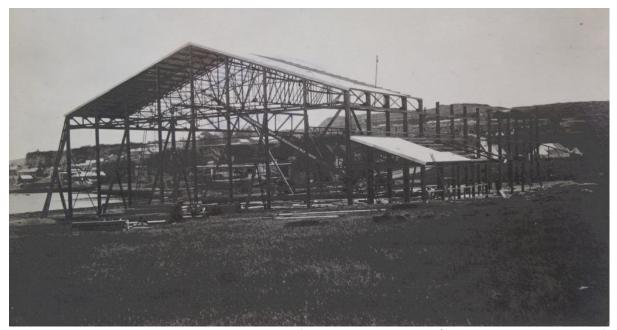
The large F-type hangars under construction, 1917 (The National Archives: Air 58/9, Admiralty Director of Works 41).
